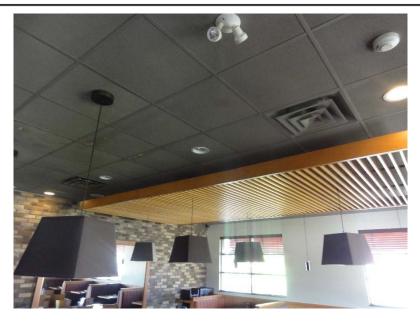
View of typical interior finishes in the sitting area of the Swiss Chalet Restaurant that occupies the Site Building.
